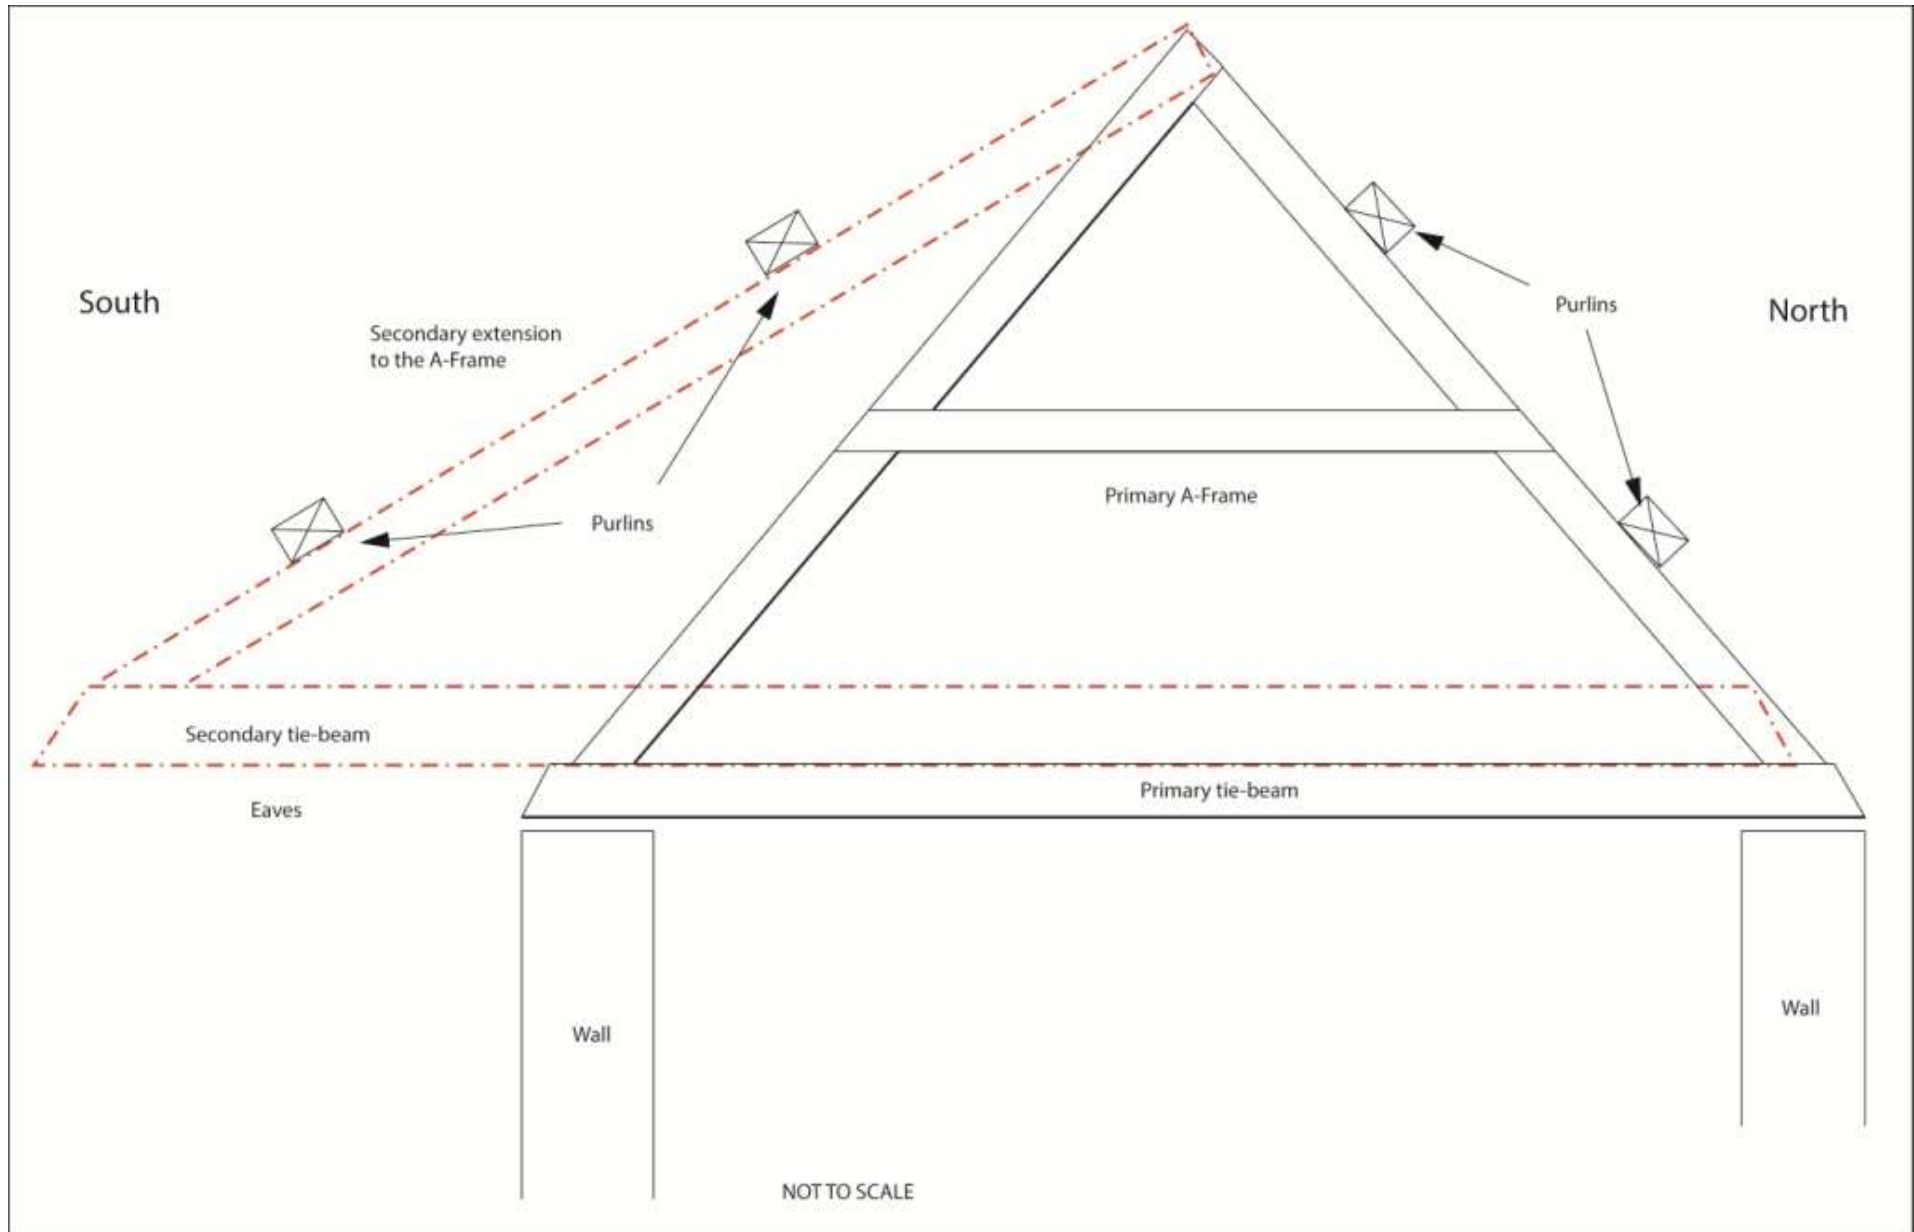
Diagram of the roof structure showing the secondary elements that formed the deep eaves.
